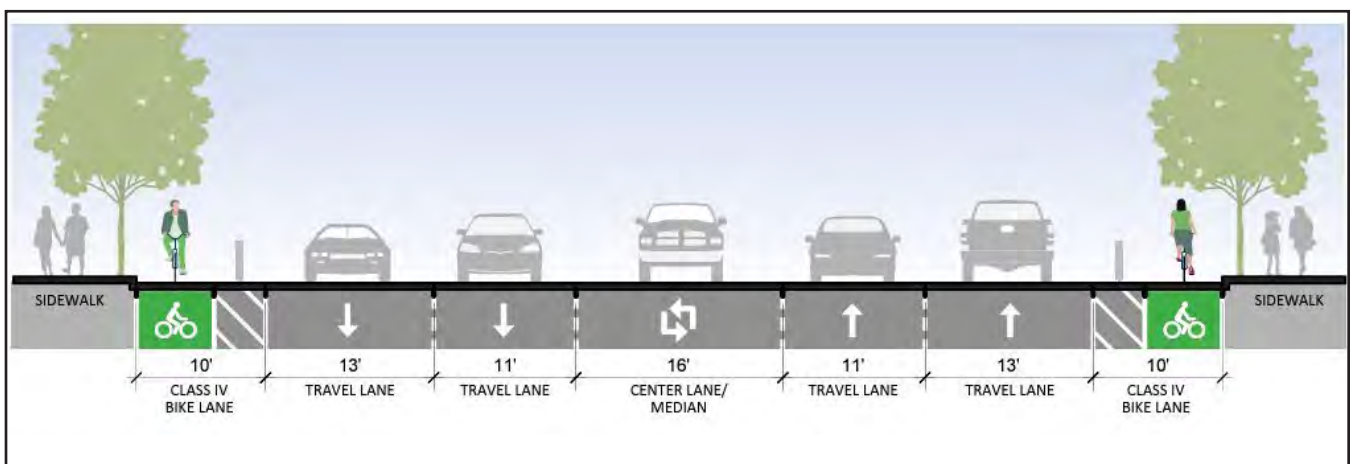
Pioneer Boulevard Cross-Section from South Street to the South City Limit
